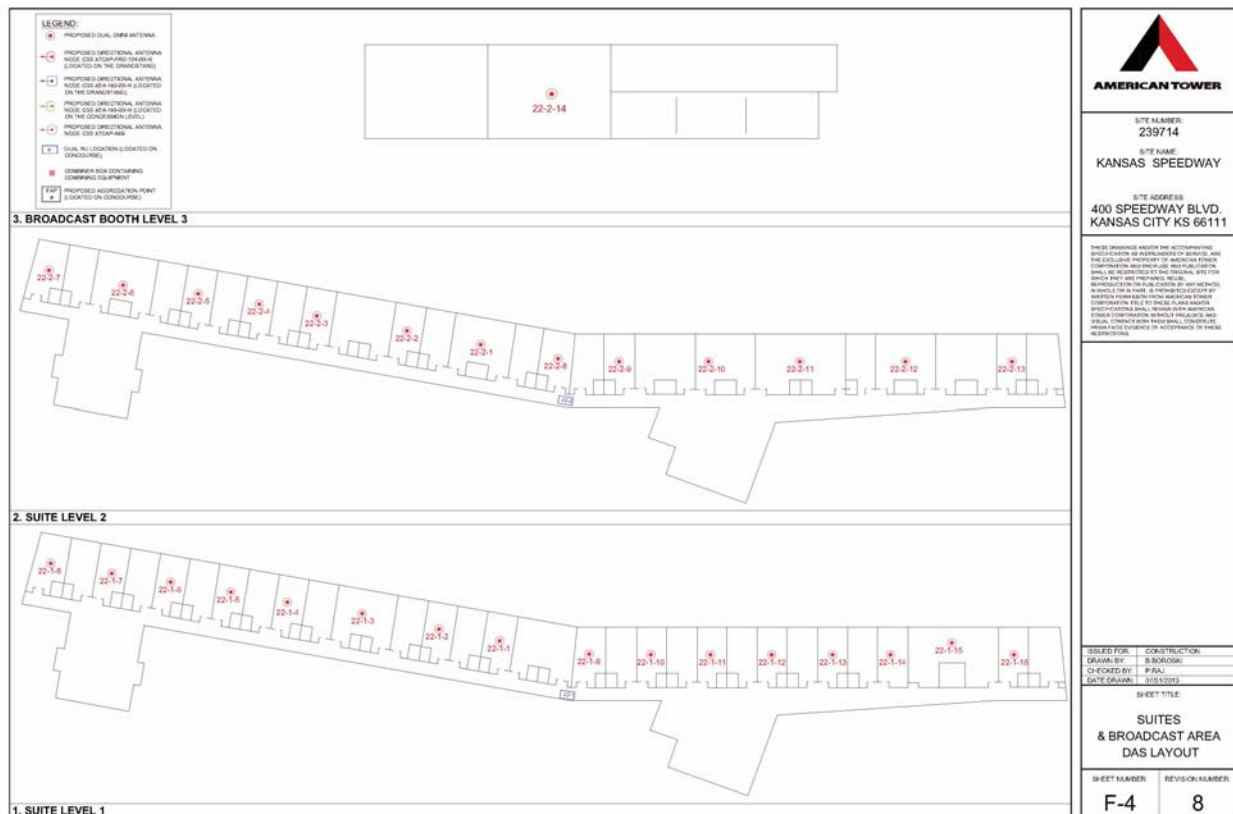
Floor plan image of Suites and Broadcast Booth used for data collection
